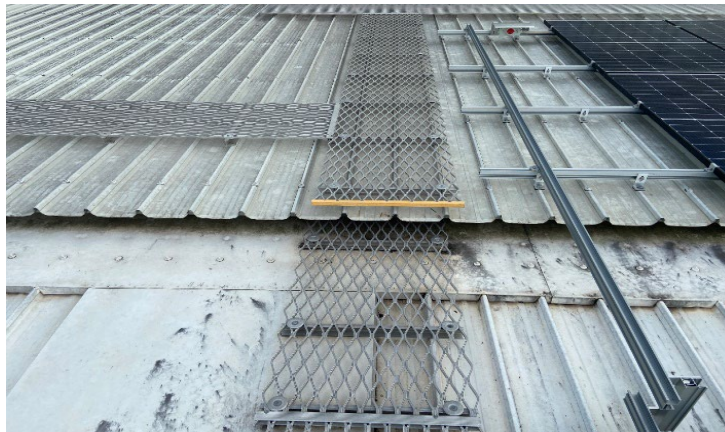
Entry 1 low lying roof – marked by strip
